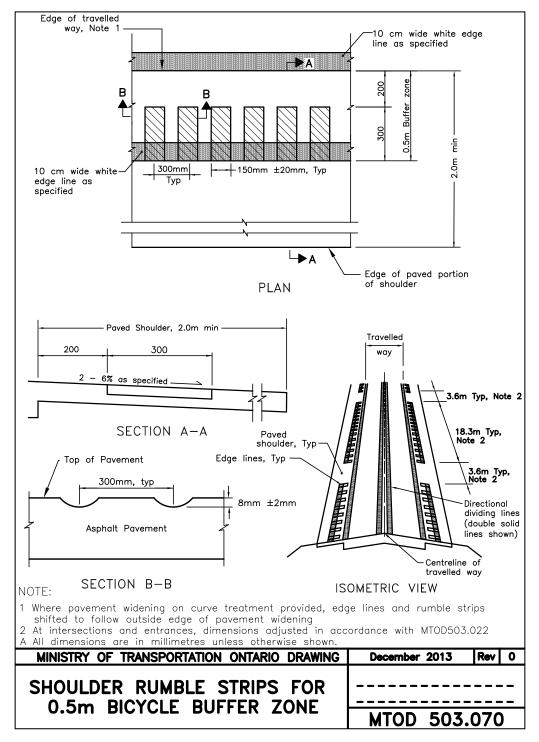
Rumble Strips for 0.5 m Buffer Zone (Detail)
